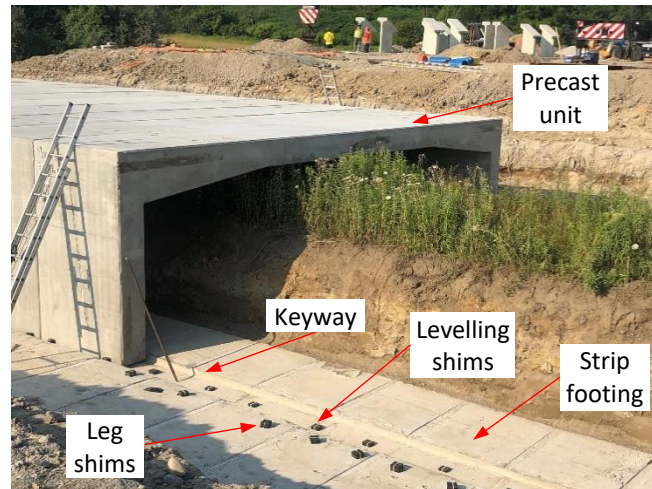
Reinforced concrete TSC system (Pickering culvert).
